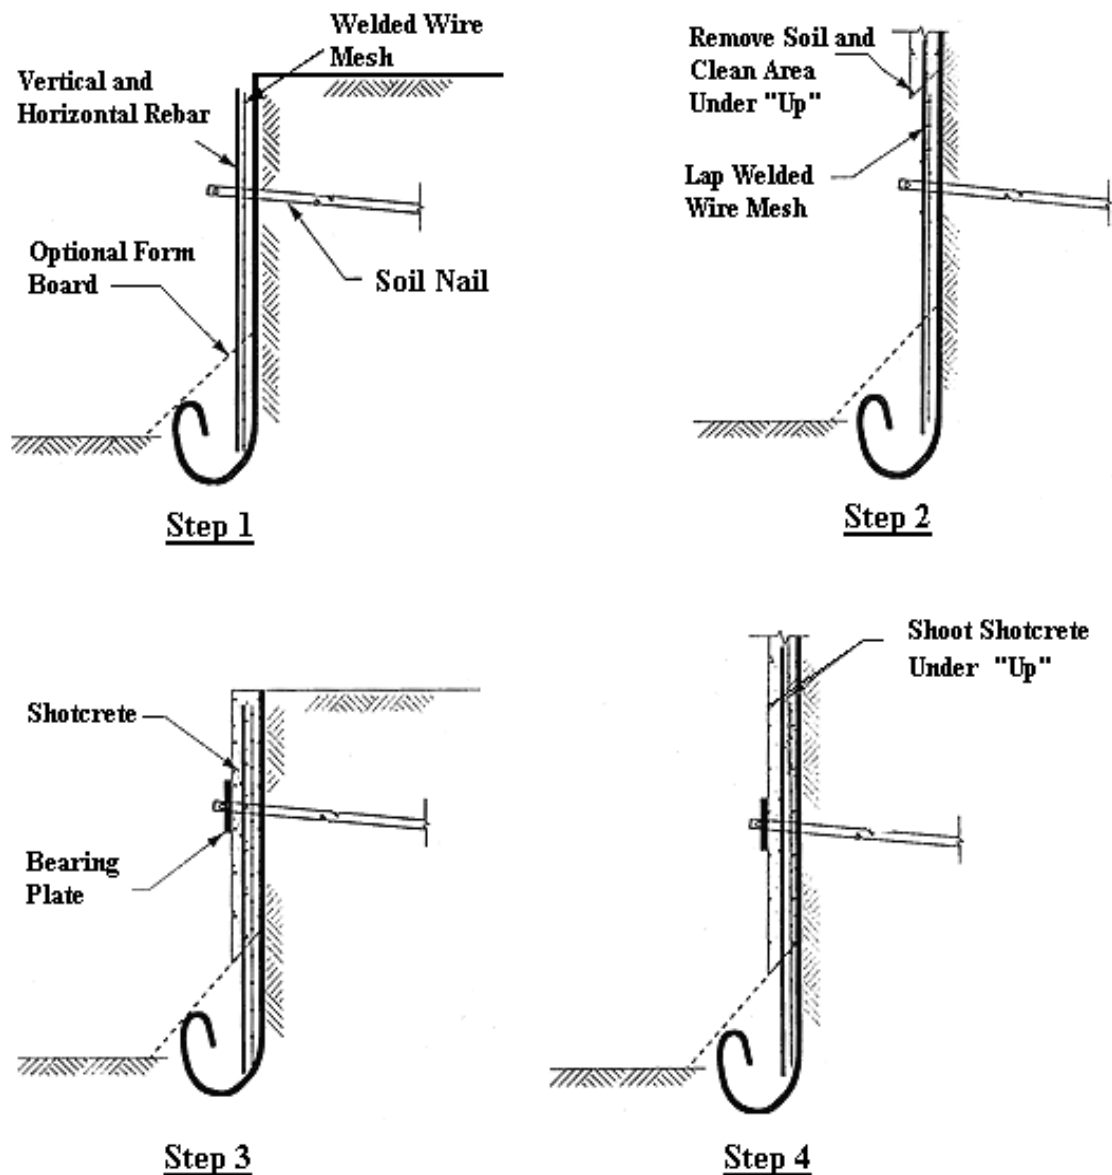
Soil Nail Wall Facing Construction Sequence [20]
